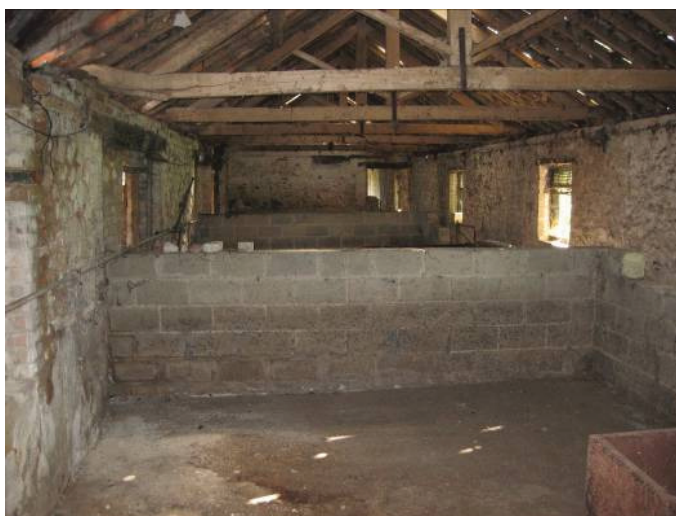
Interior of Room G, showing modern breeze block pens and 19th century doors, windows, walling and roofing, looking south
